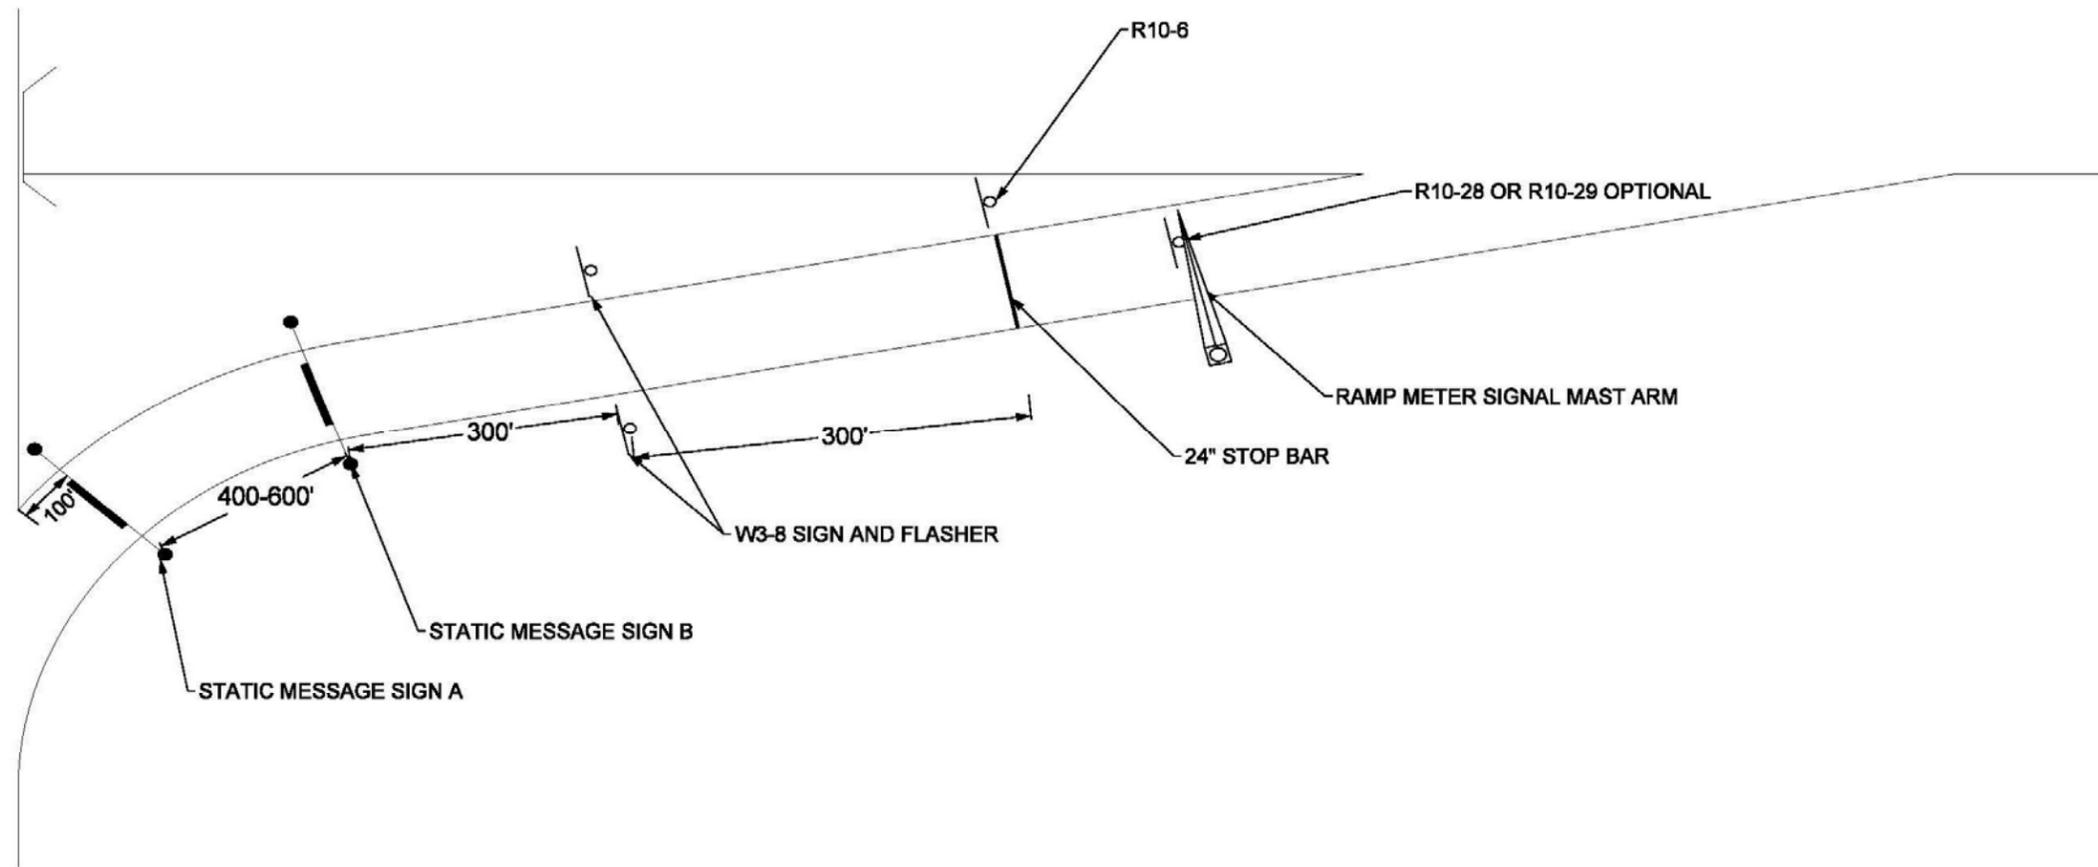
Single Lane Loop Ramp Meter Signing and Pavement Markings
